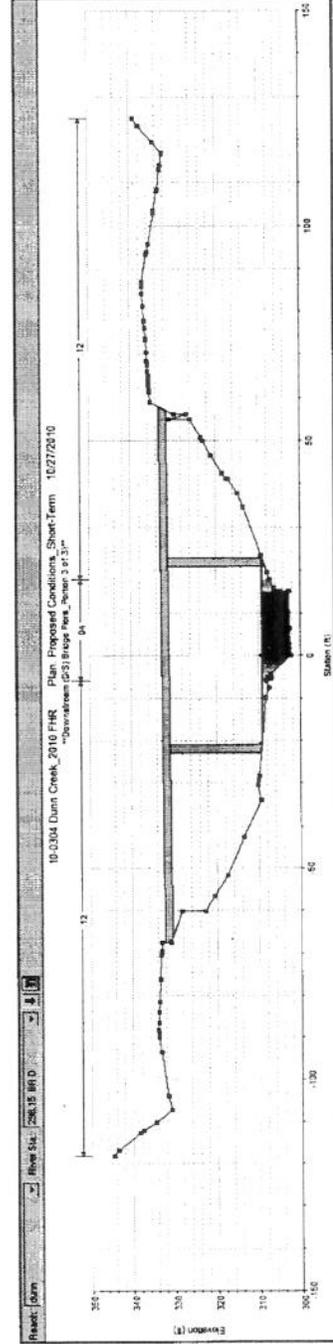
C - Channel Cross-Section at Downstream Face of Proposed Bridge (River Station 298.15 feet)
